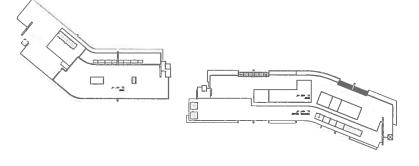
BUILDING PLAN - ROOF LEVEL ONE BEVERLY HILLS
